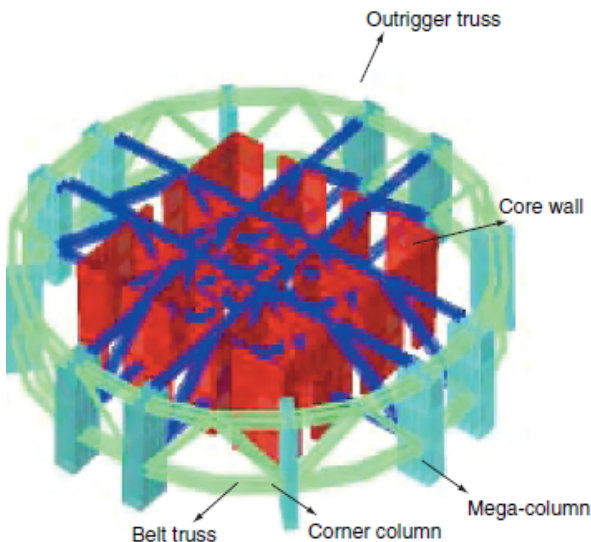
Strong Core and Mega Columns - Shanghai Tower
